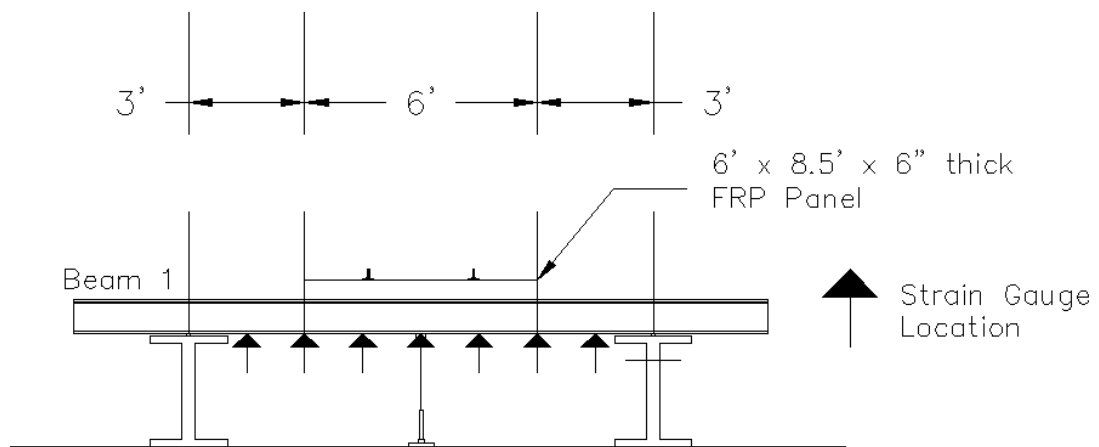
Cross Section - Simple Span/Cantilever Test - View Toward North
